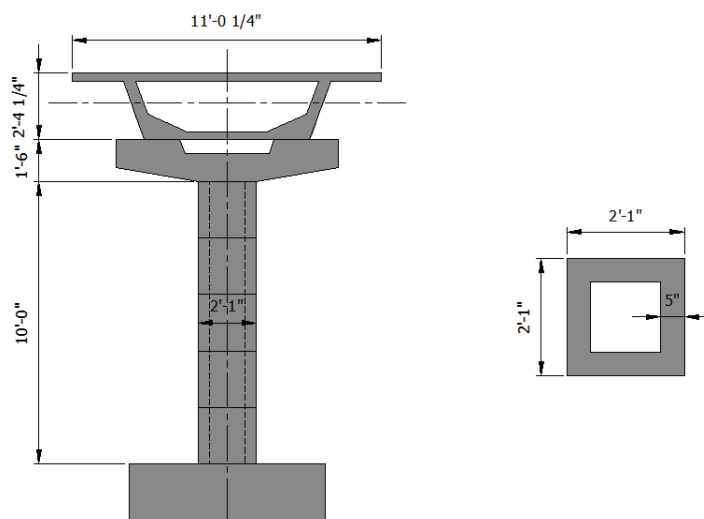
Transverse elevation of bridge test model and pier cross-section
